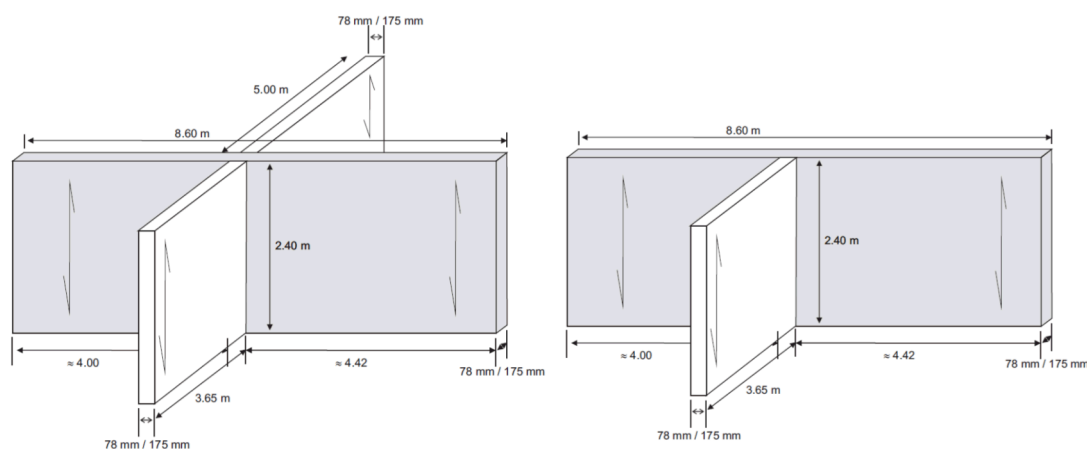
2: Dimension of vertical (wall-wall) junction mock-ups for measurement of Vibration Reduction Index according to ISO 10848; left: wall-wall cross (X-) junction, right: wall-wall T-junction
